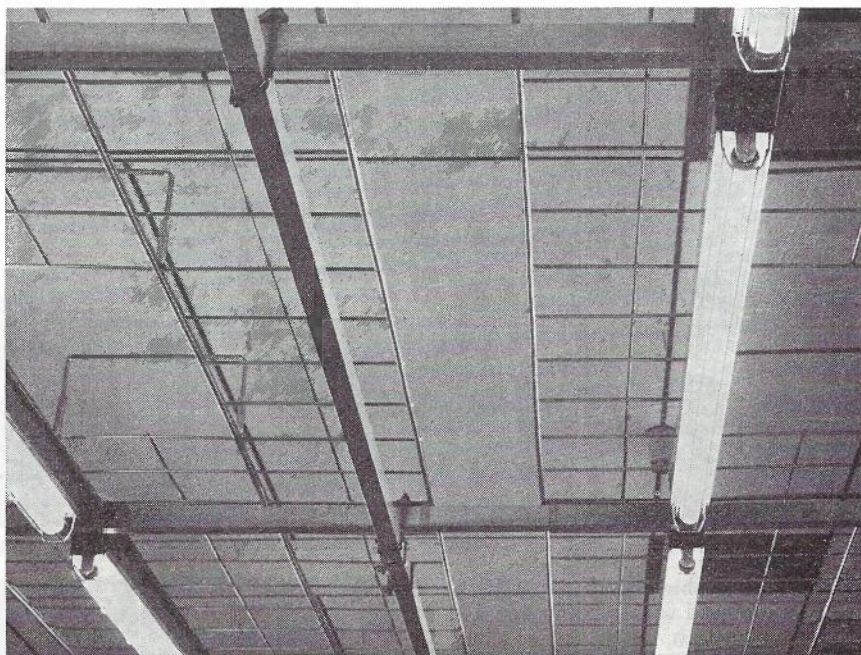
General View of Mesh showing Access Holes and Cable Guards.
